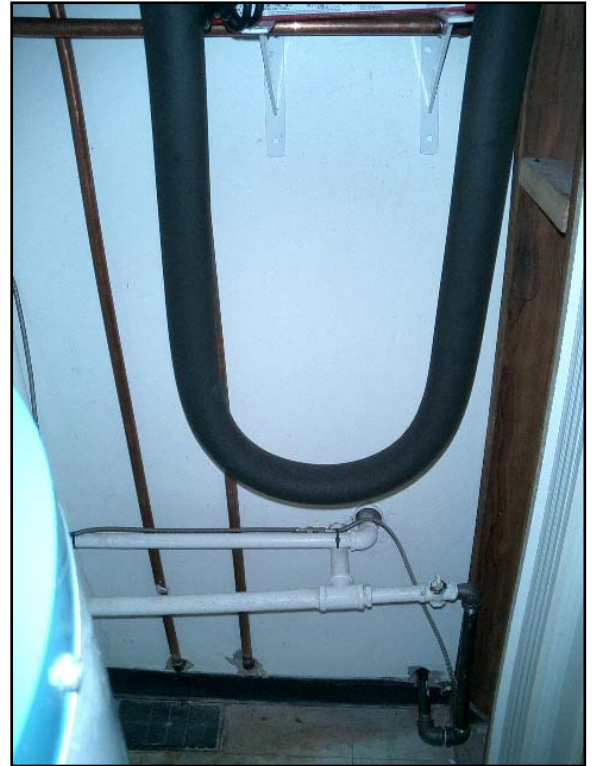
Lower coil section of the Heliodyne heat exchanger
